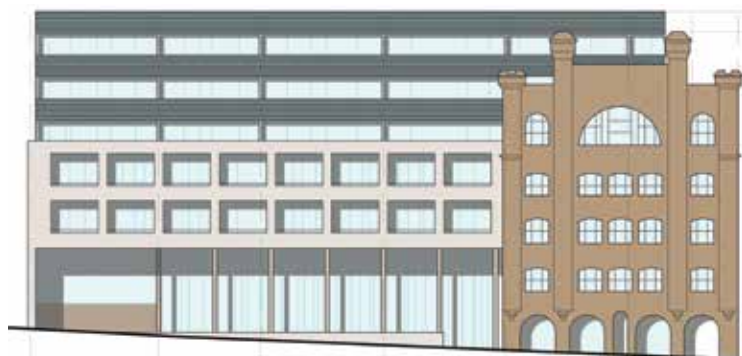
Bolton Street carpark - proposed street elevation (TZG 2012)
